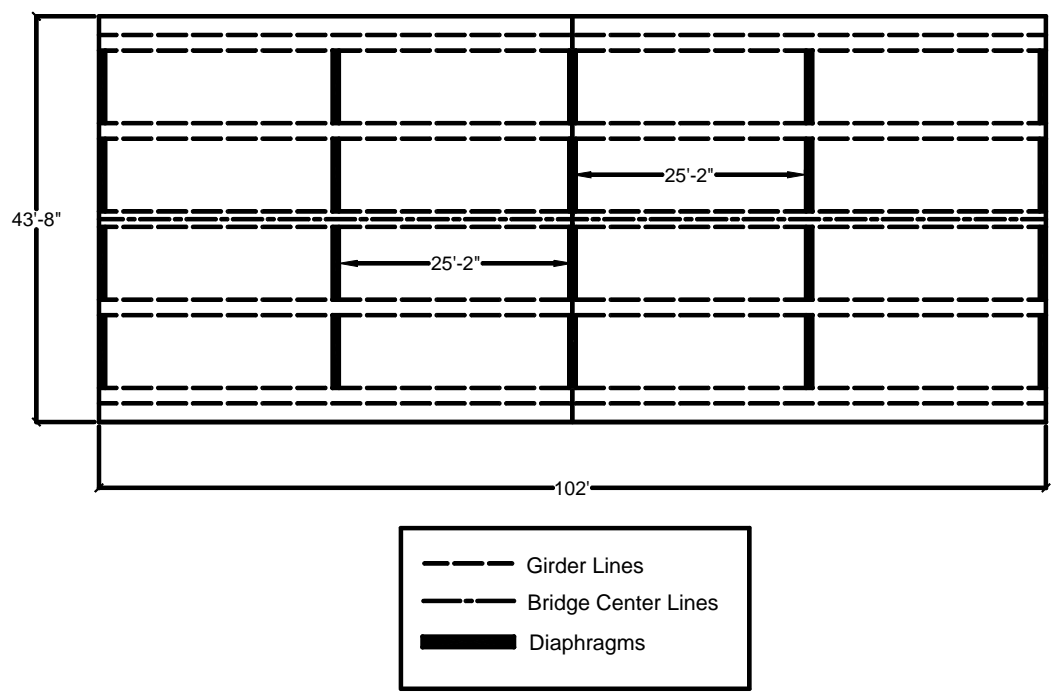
Diaphragm Configuration – Slaughter Creek Bridge
